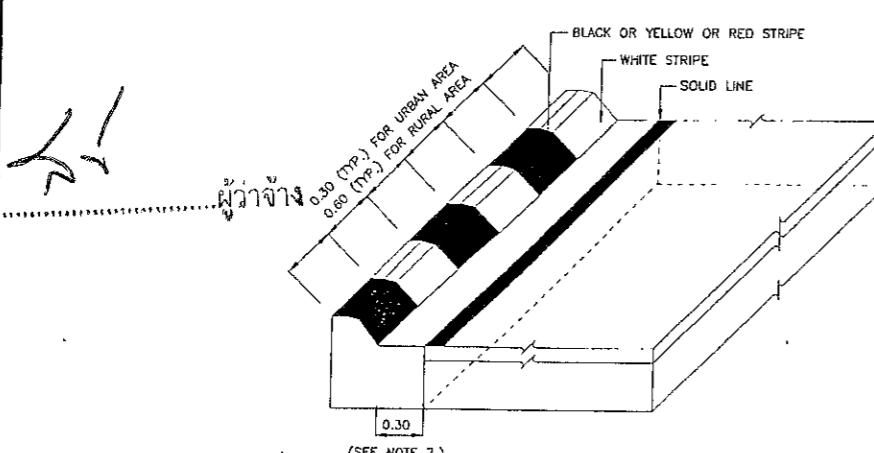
DETAIL OF CURB AND GUTTER OR CURB AT RAISED MEDIAN
